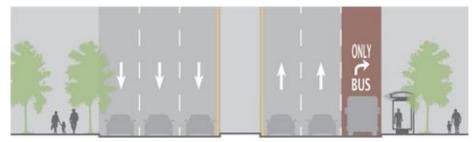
| Alternative 6 Cross-section of Spring Hill Road from International Drive to Boone Boulevard
